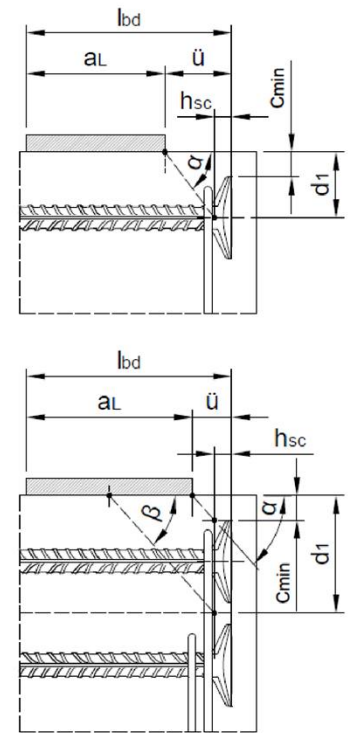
Anchorage length in the corbel for single or multiple layer of reinforcement
